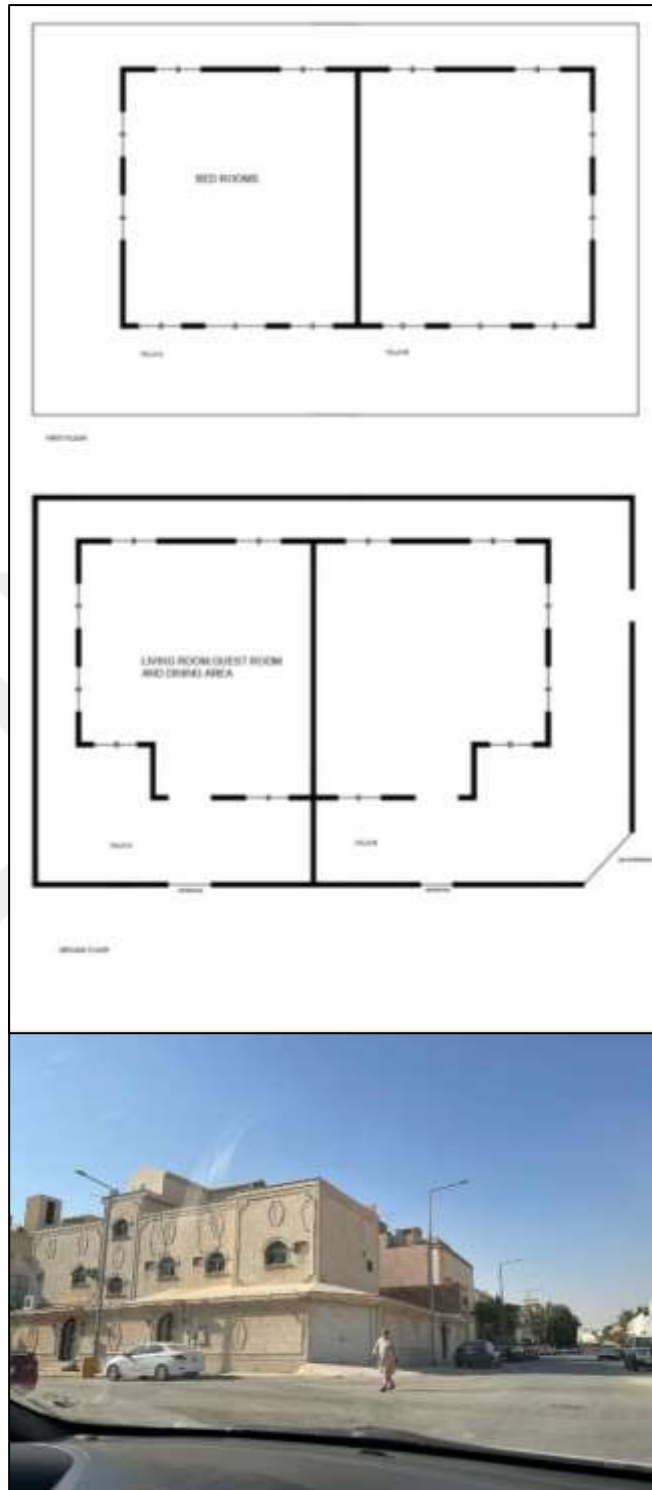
Villa House Plans and Elevation of Attached One Side Type by the Author.
